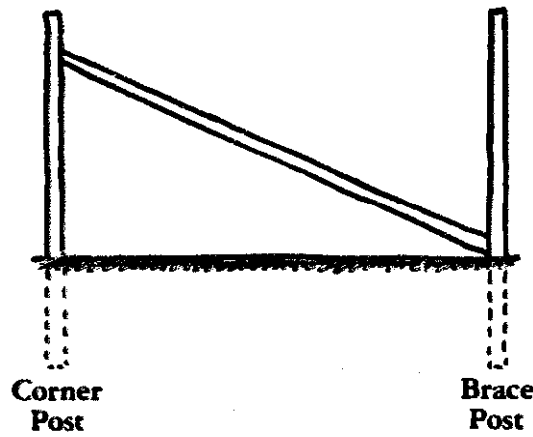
Bracing a corner post with a single strut placed at an angle.
